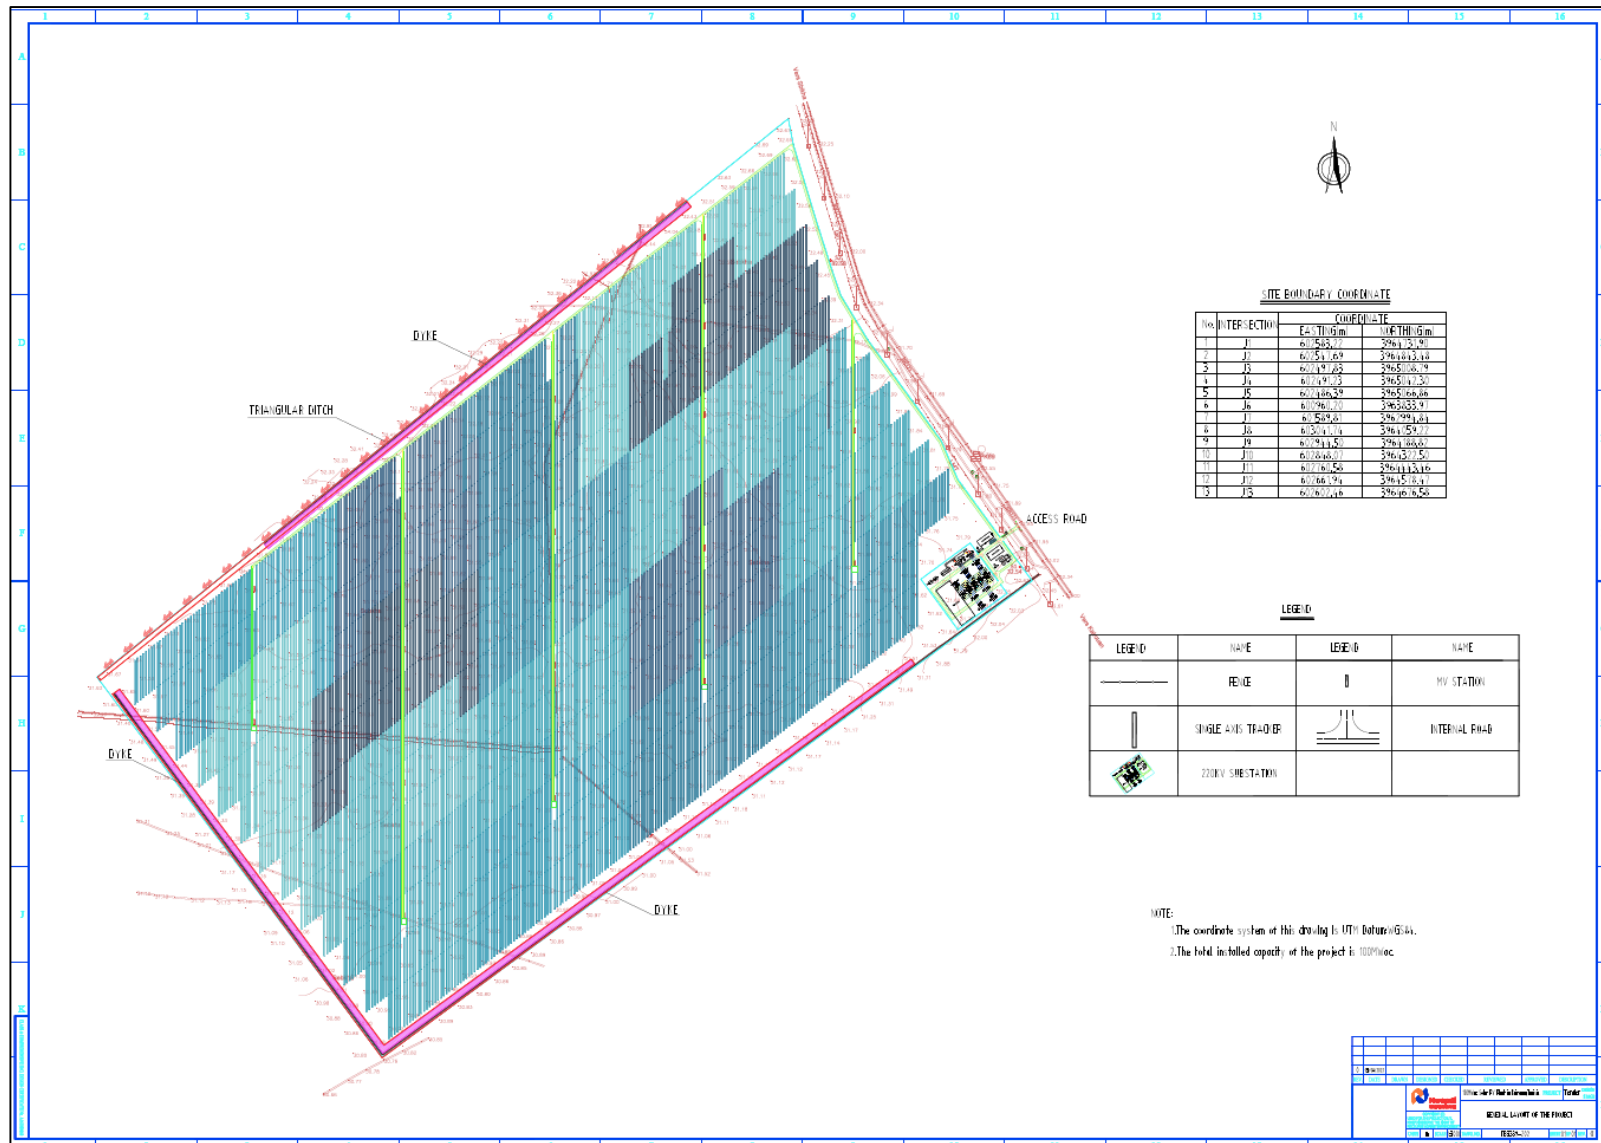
Layout of the Proposed Photovoltaic Plant
